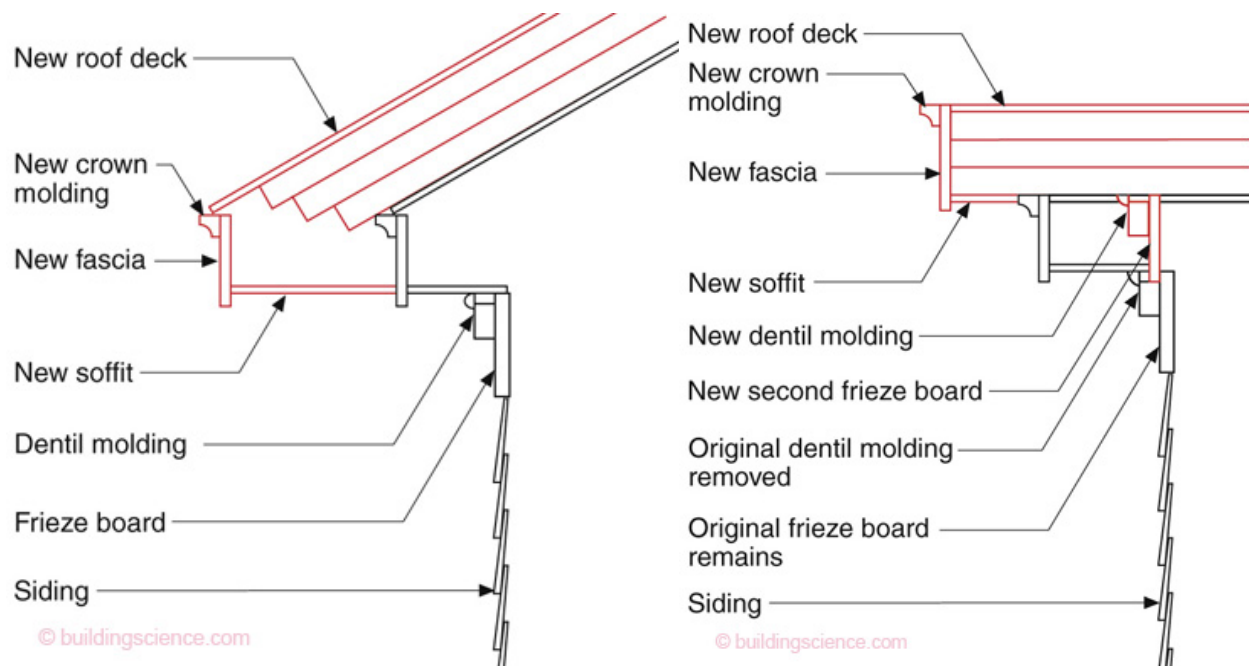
Adding above-deck roof insulation—shown as long red rectangles on top of the existing roof deck—to eliminate thermal bridging and improve the performance of the roof assembly results in substantial additional detailing work along the roof edge (left) and gable ends (right), which adds materials and substantial labor costs to the overall project.
